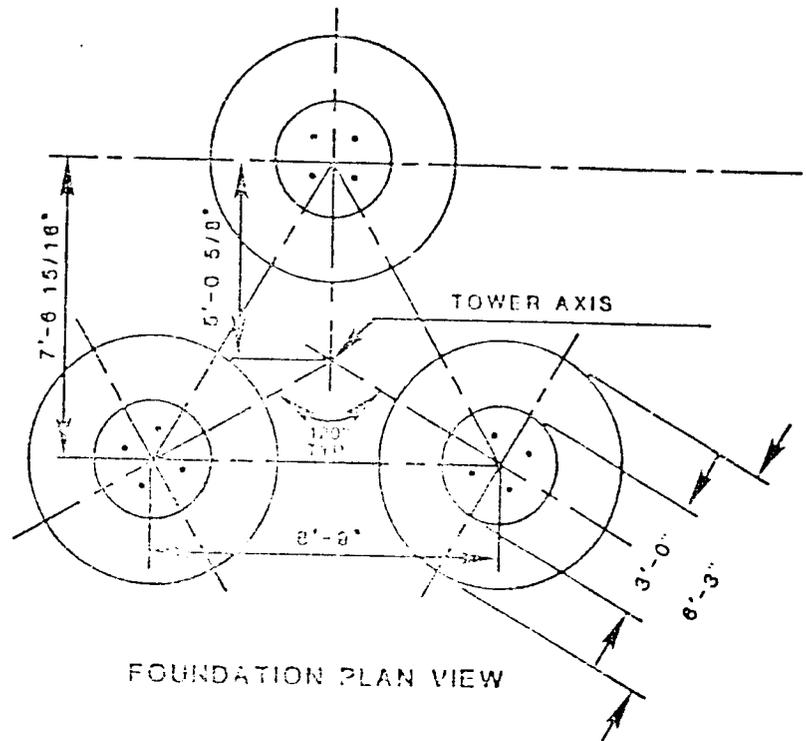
MAT FOUNDATION DETAIL FOR AN 80 FOOT TOWER
